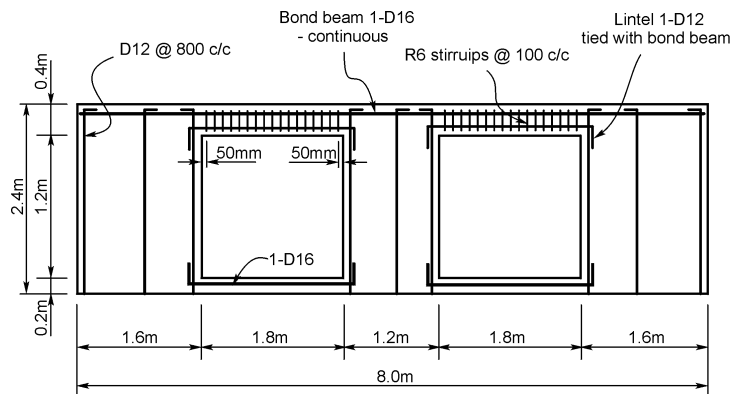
Typical wall reinforcement layout (shrinkage control joints not shown for clarity).
